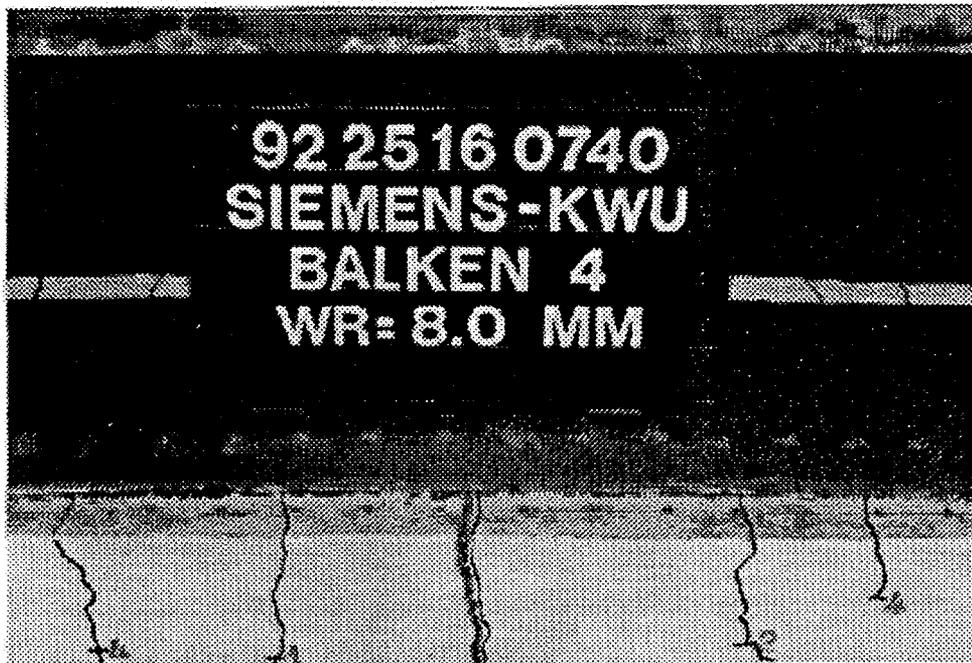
Composite liner during test - crack width of 8 mm without failure
